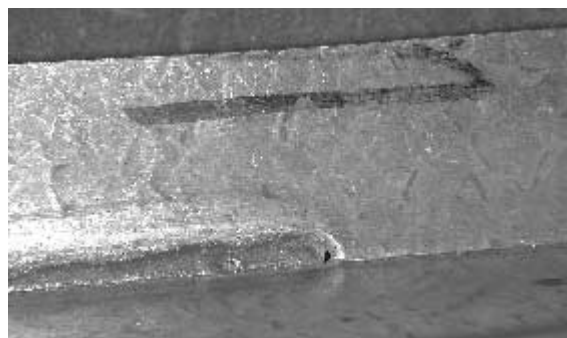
Fracture at the tension end of longitudinal flare-bevel weld
